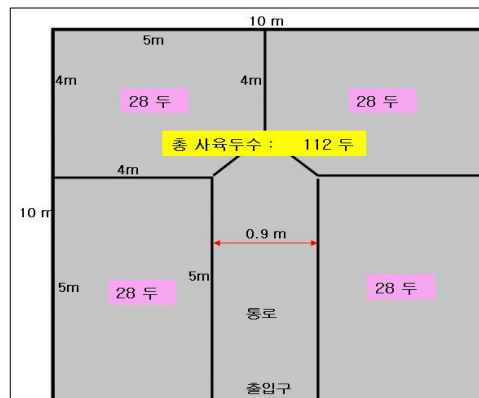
Farming environment of C pig house and structure of room(C-3 room).
